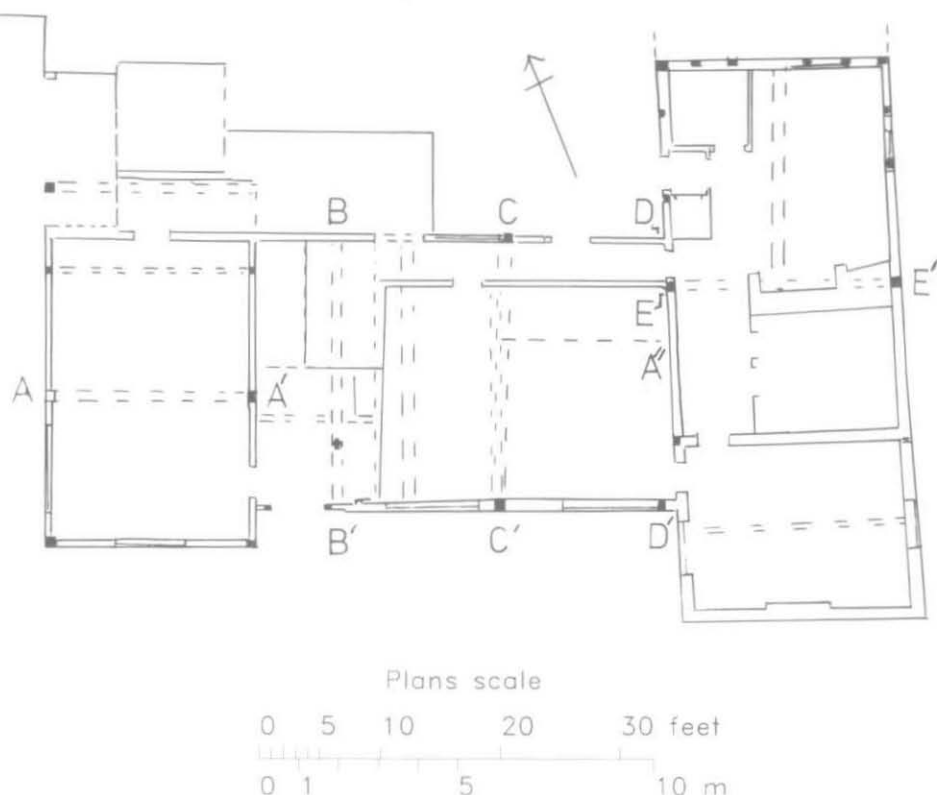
South Moreton Manor (Sandervilles'); plan.
